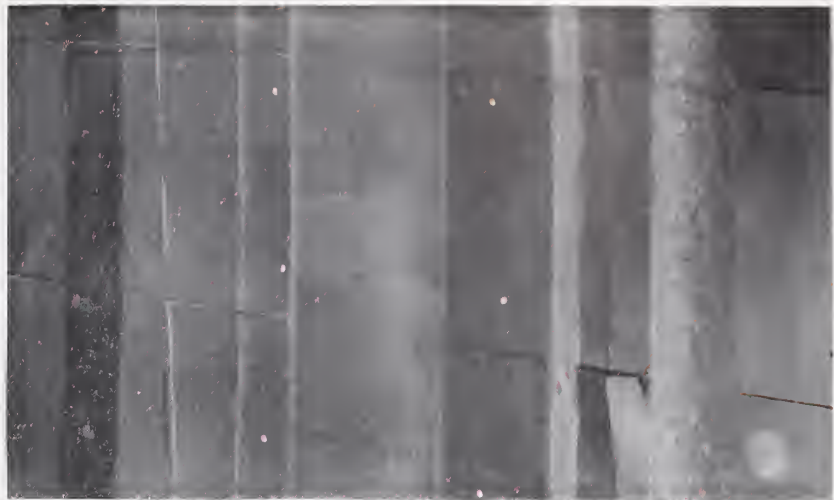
$\frac{1}{8}$ -in. asphalt tile, asphalt type, on concrete sub-floor (test panel 17R).
